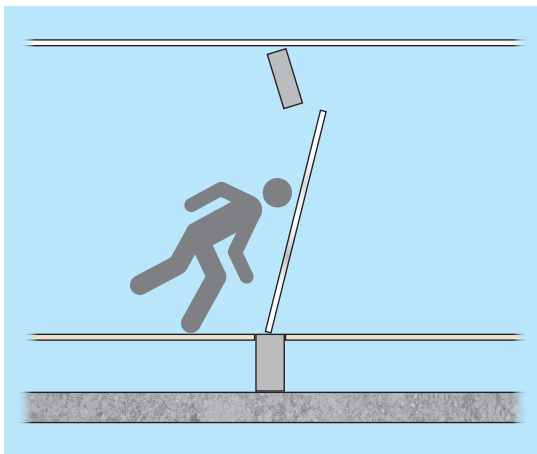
Any drop bulkhead should be capable of supporting any defined load on the glazed partition.
